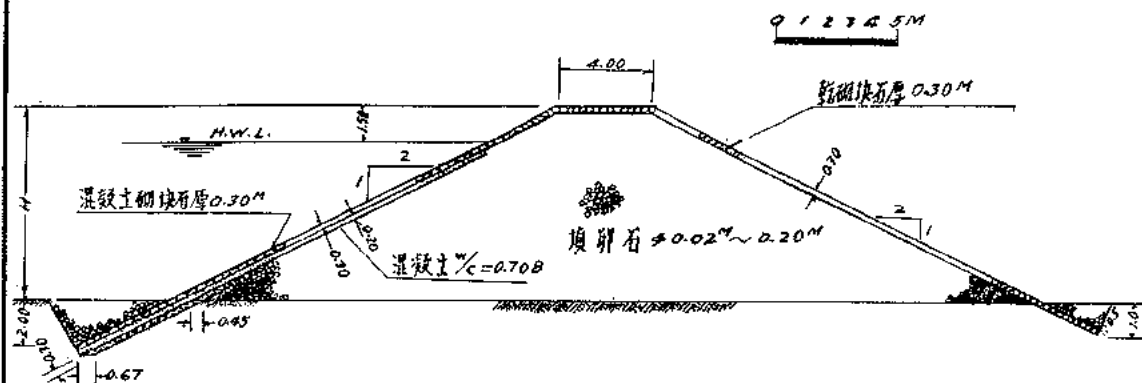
TYPICAL SECTION OF SANDY GRAVEL LEVEE
